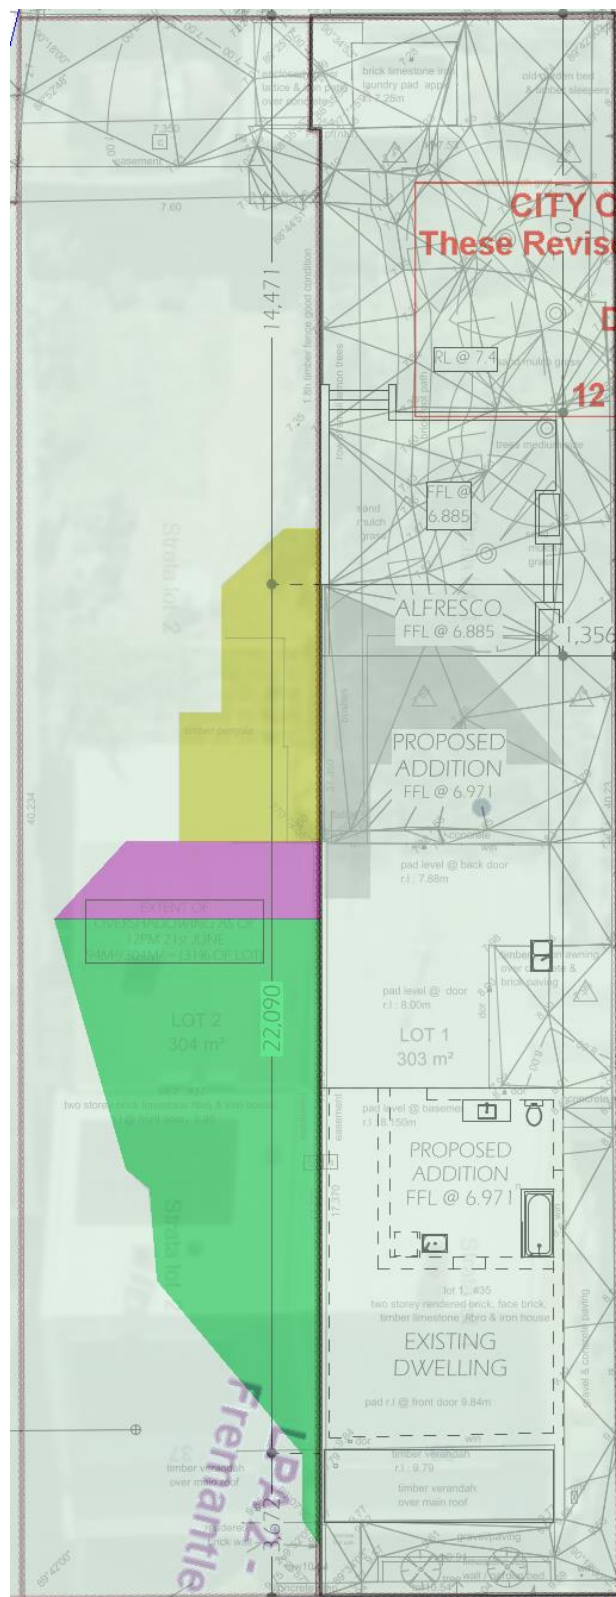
Aerial image overlay of the dwellings across the amended shadow plan – adjoining dwelling solar collectors are not impacted by shadow from proposed rear additions.
